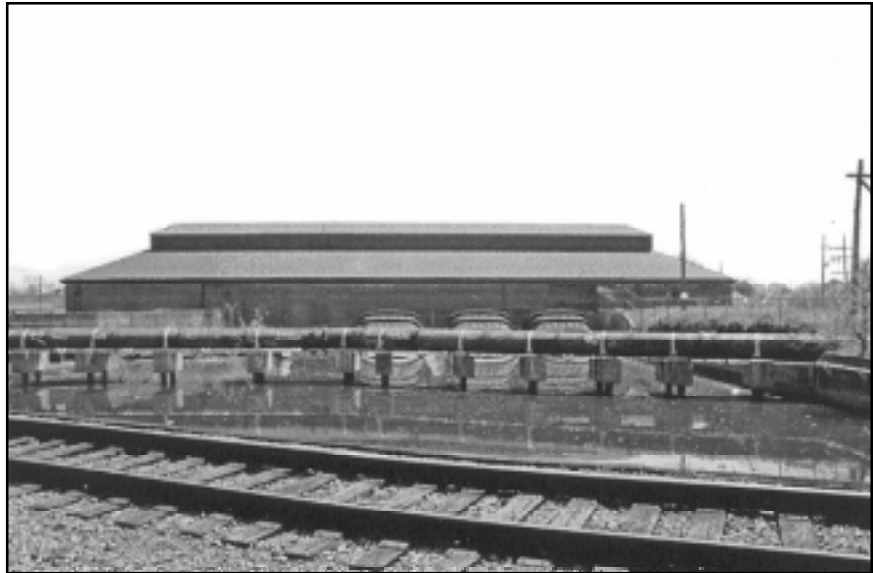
Drainage Pumping Station No. 3. Currently existing station viewed from the north.
